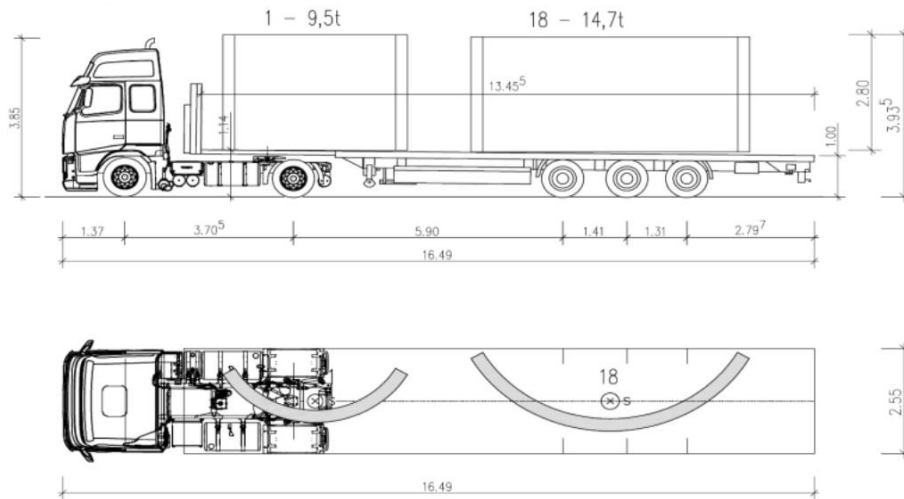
Clearance, on-site concrete parts transportation, as example for a part of concrete section
